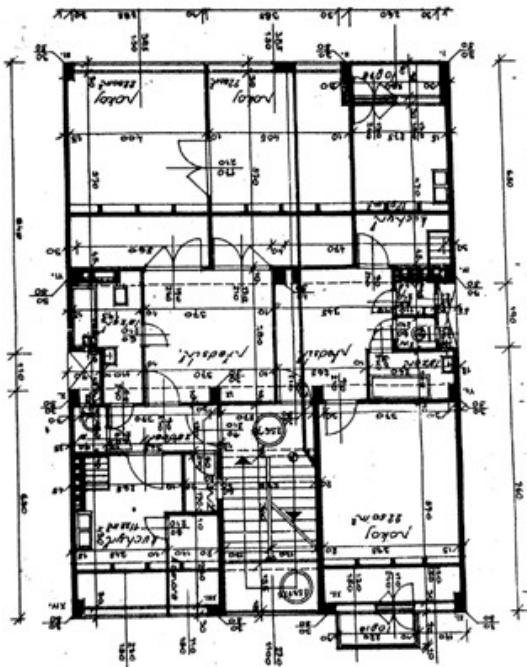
Plan of apartment buildings in Družstevní Ochoz street, designed by Jan Gillar; source: Praha: Architektura XX. století (1998).
